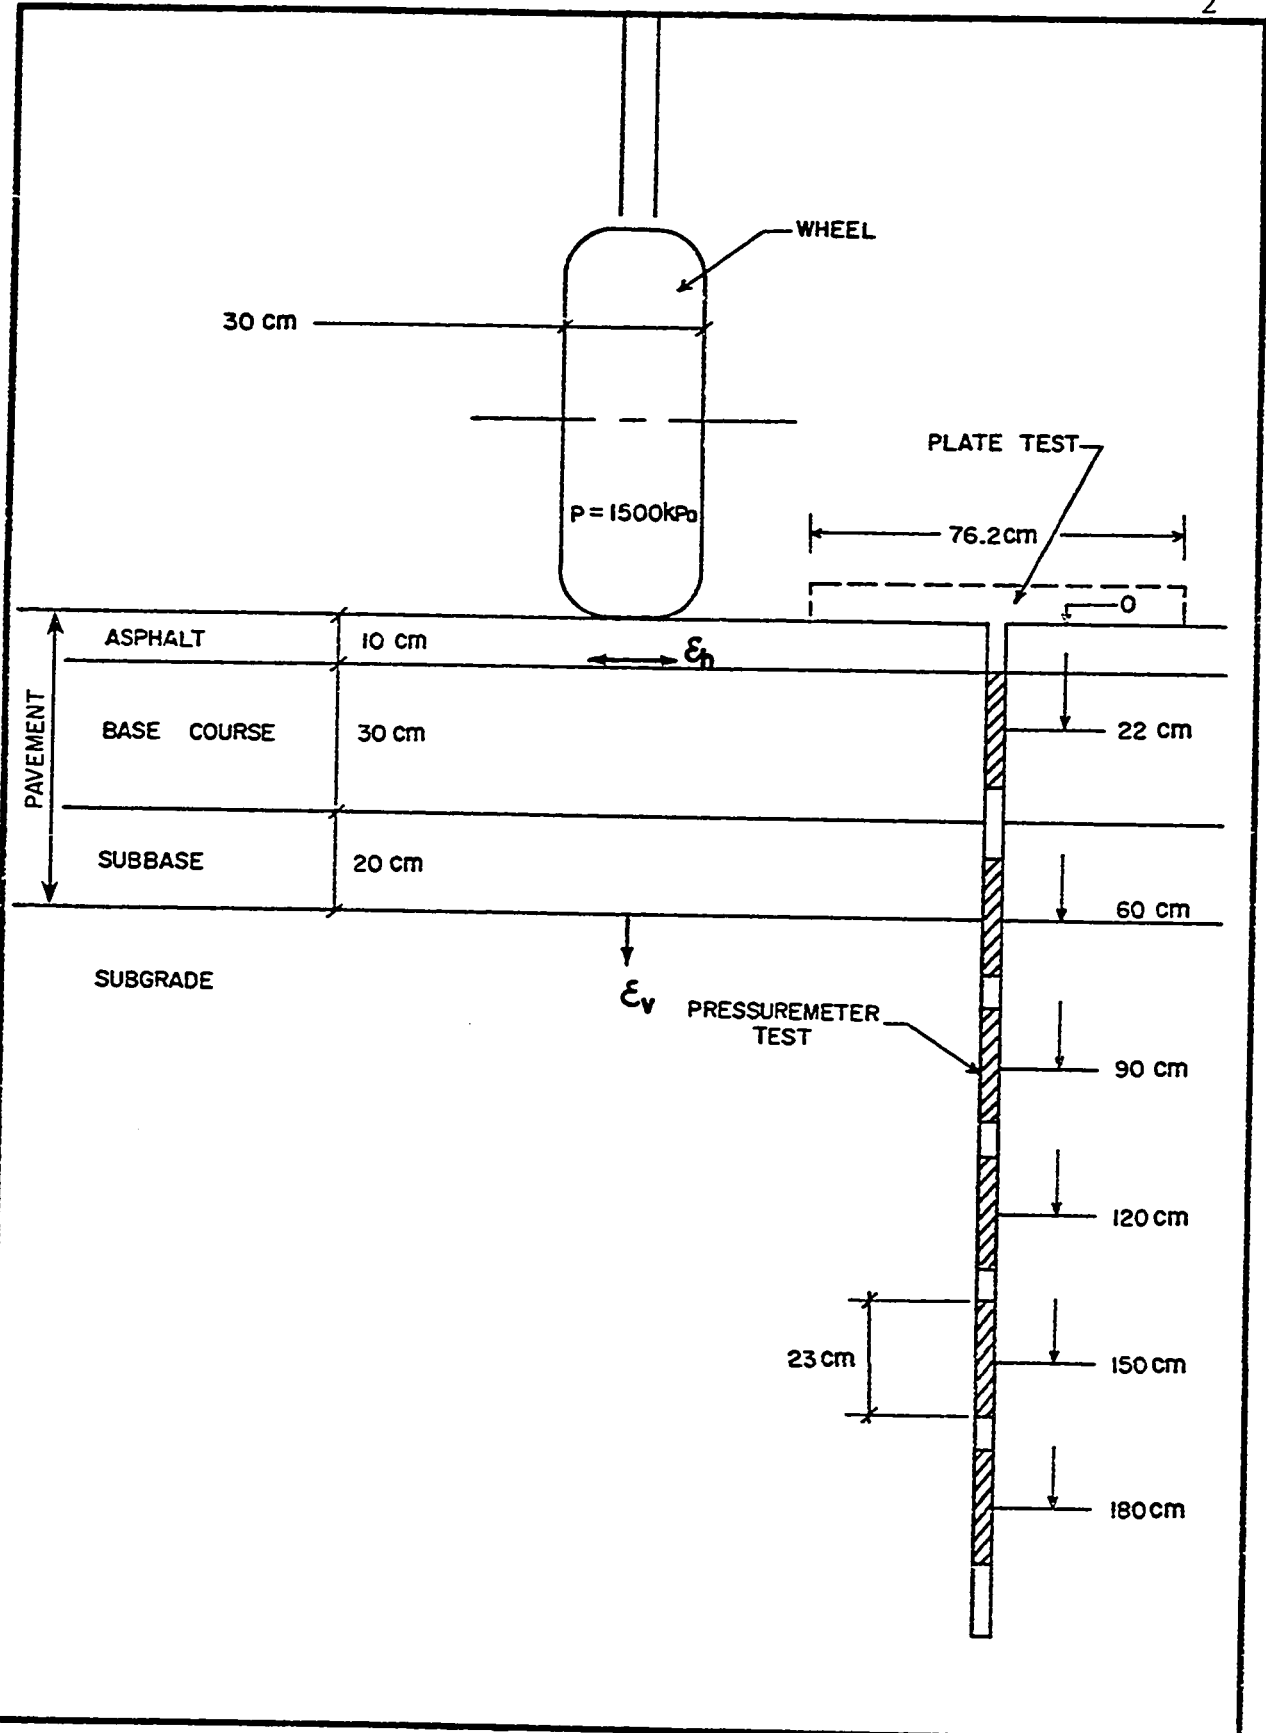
Typical Pavement Cross Section and Position of Tests.
